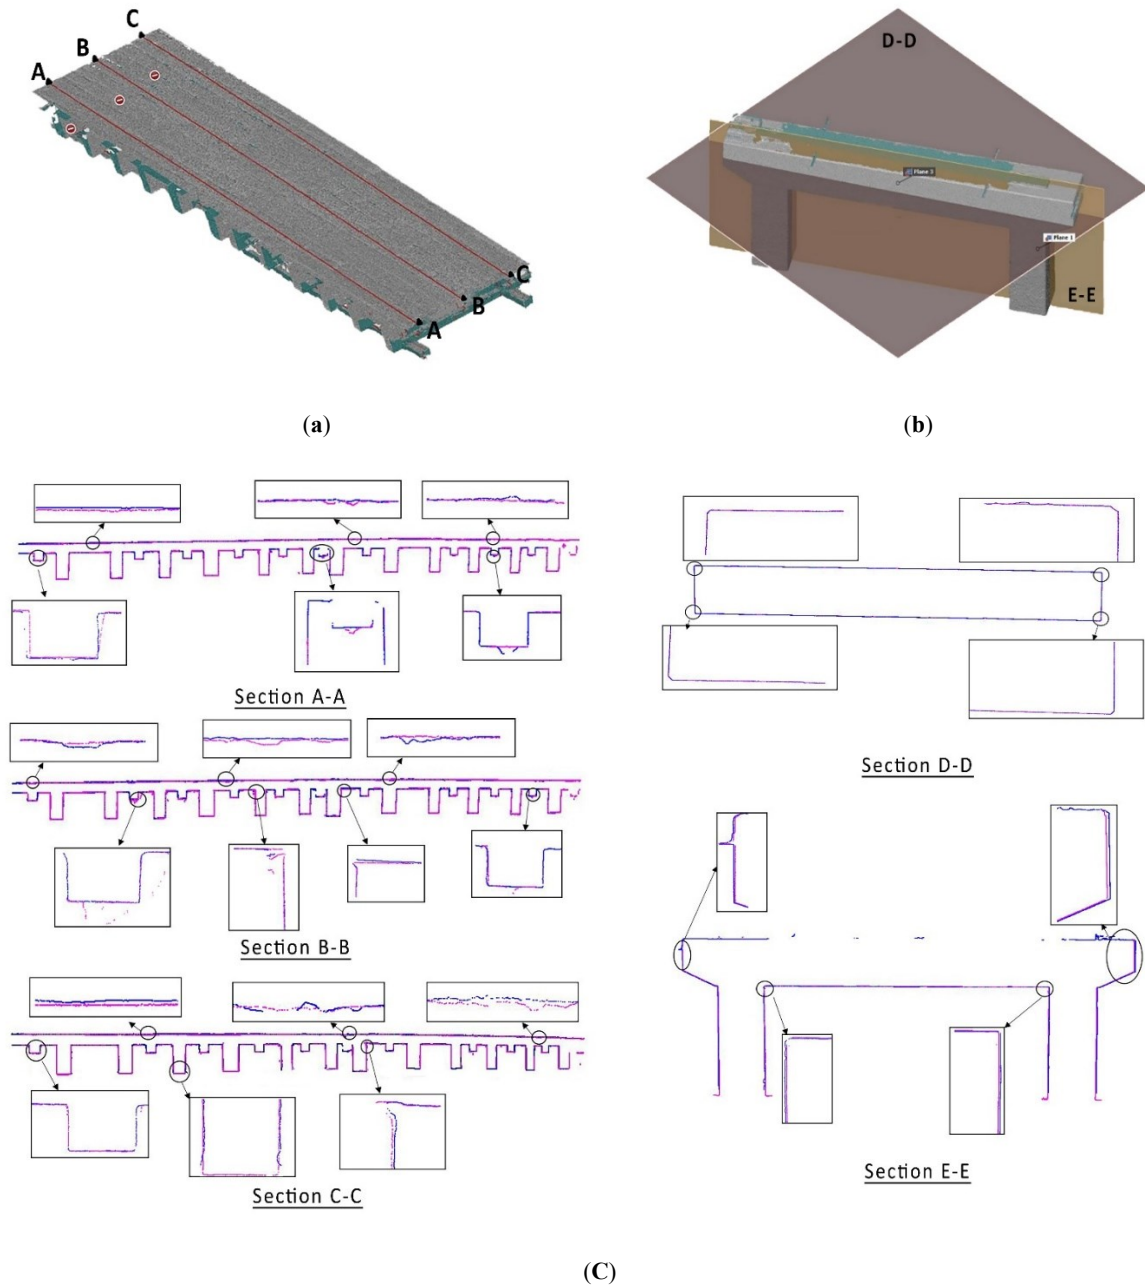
The inspected cross-sectional profiles of the bridge; (a) Bridge deck, (b) Piers, (c) Cross-sectional profiles and details, blue lines: UAV data, red lines: TLS.
